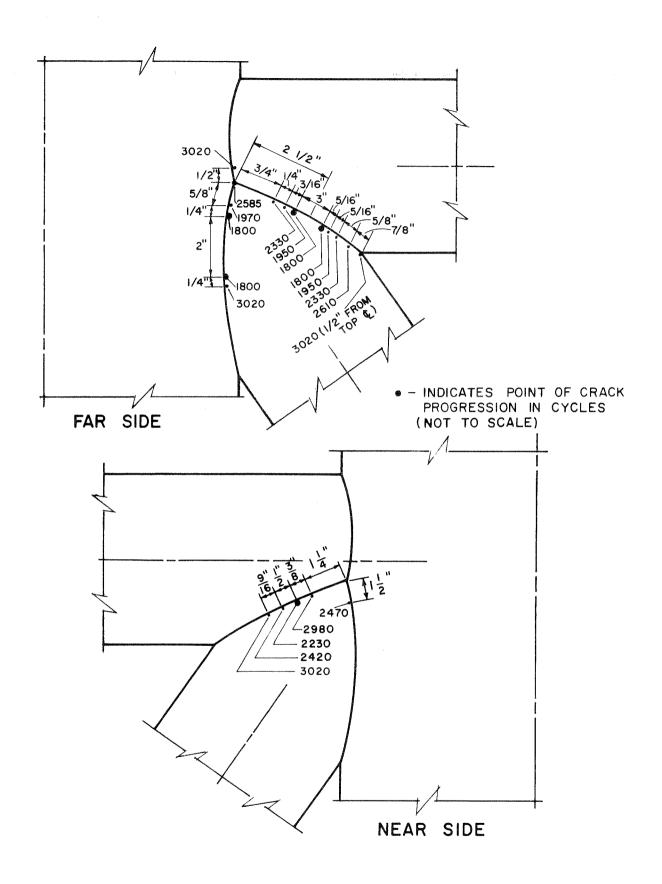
FIG. || CRACK PROPAGATION IN TYPE 2 JOINT LOADED AT ± 50 K IN HORIZONTAL MEMBER
